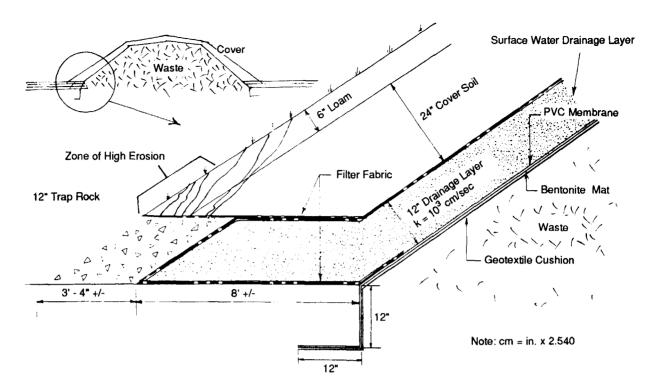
Case 3—Outlet detail for sideslope toe surface water drainage layer.
